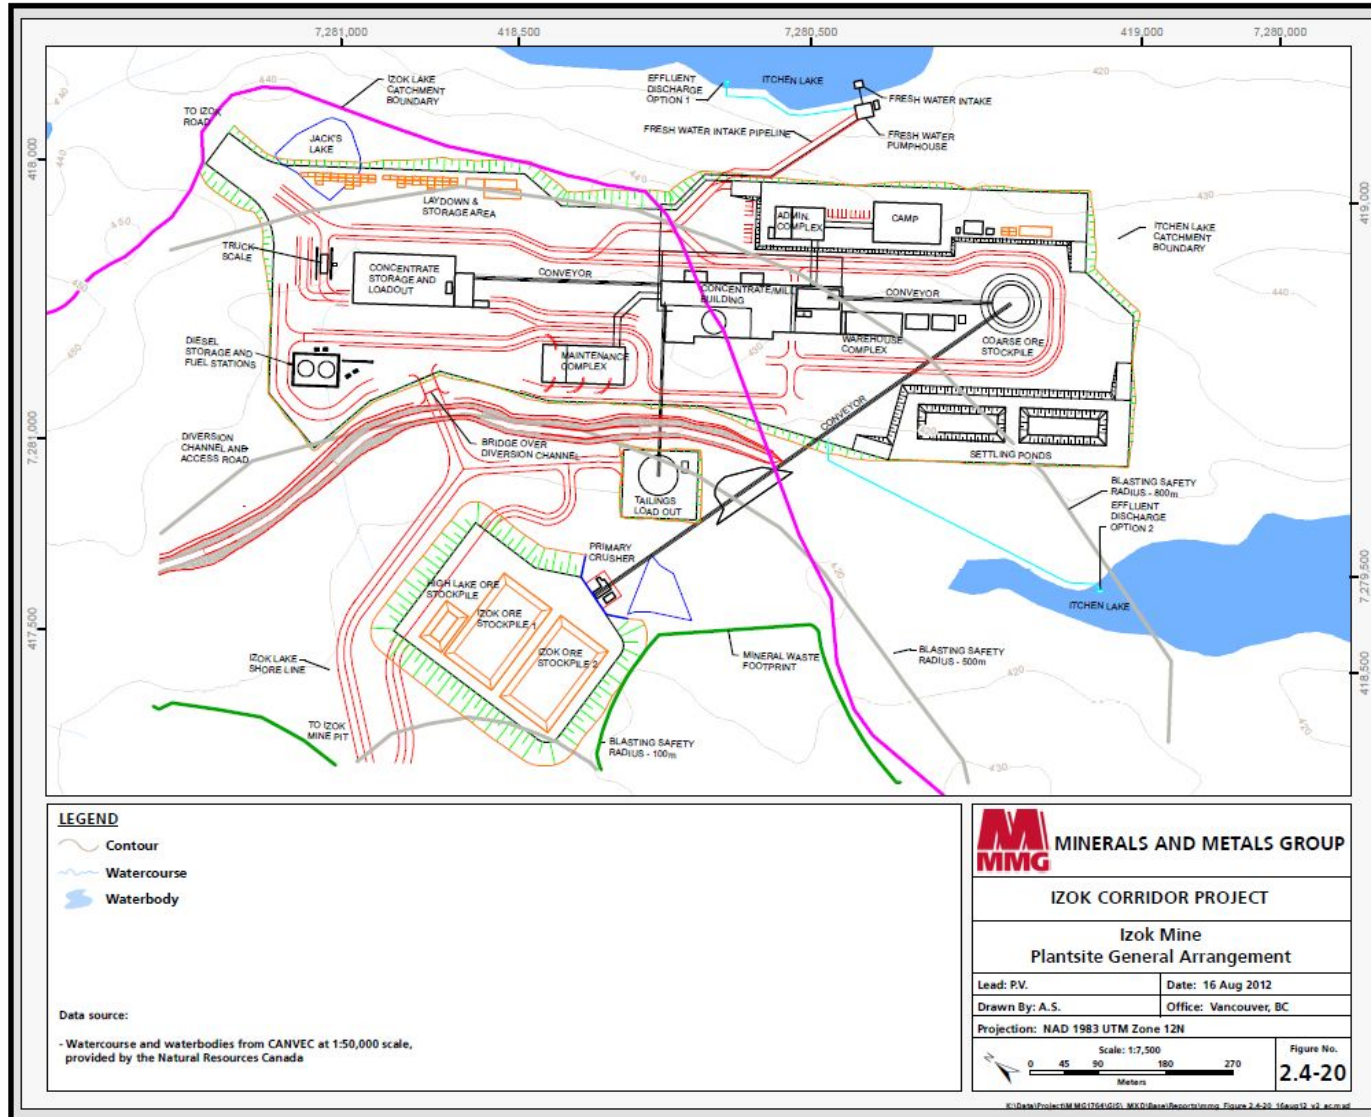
Izok Mine Plant Site General Arrangement
